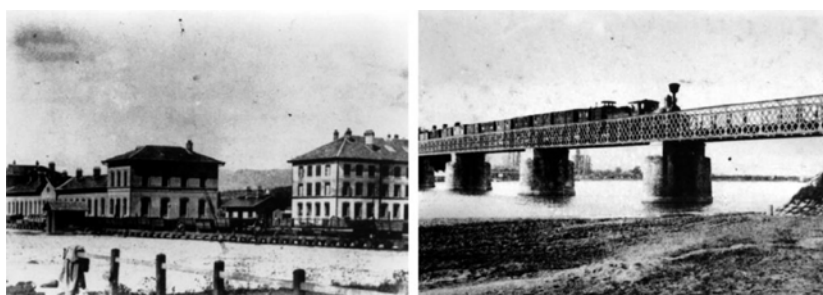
Construction of the first railway complex at the present Zagreb West Railway Station (left) and bridge over the Sava River near Zagreb, 1864 (right)
